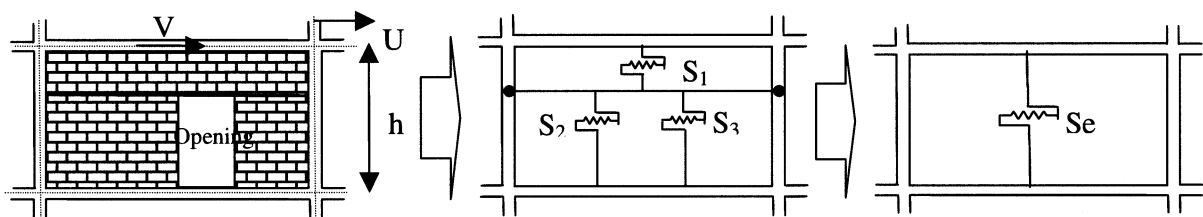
e. Infill masonry walls with one-door-opening Type F.
